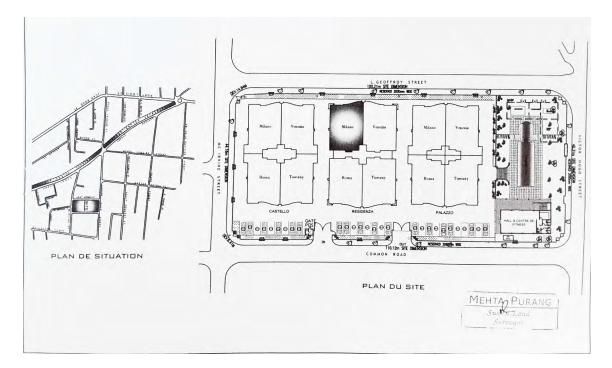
Site plans: Location plan (left), Site plan (right)* (2011)
